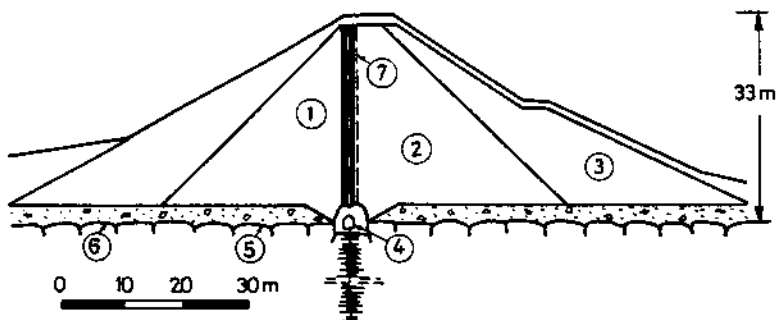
Use of geotextile downstream of soil-cement central core 1) Dry diaphragm wall, 2) Semi-imperious material, 3) Rockfill shoulders, 4) Grouting and control gallery, 5) Alluvium, 6) Bedrock, 7) Geotextile (List 1982).
